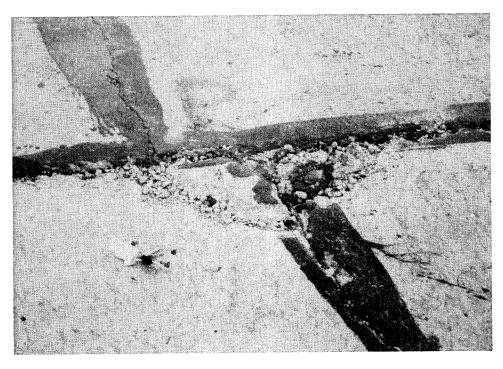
Spalling (Lane I) at intersection of transverse crack and longitudinal construction joint
